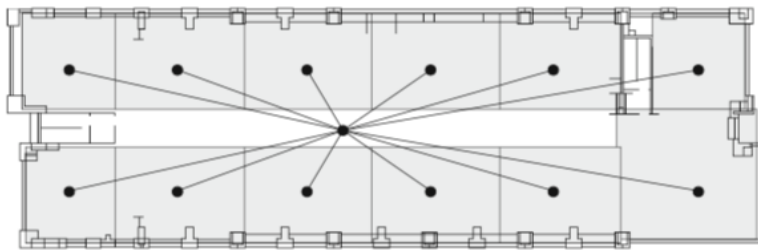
Example of a segmented office floor plan. Taken from [4].
